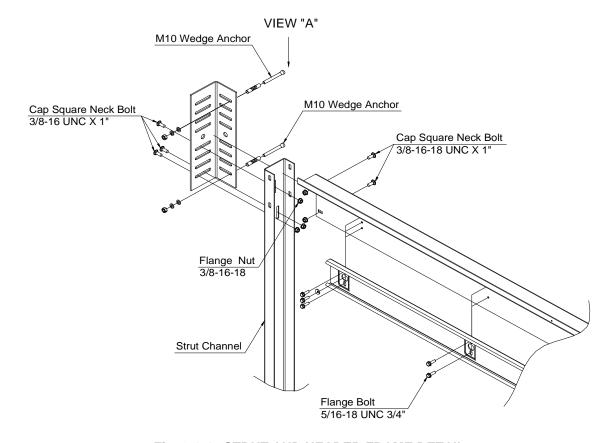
STRUT AND HEADER FRAME DETAIL
